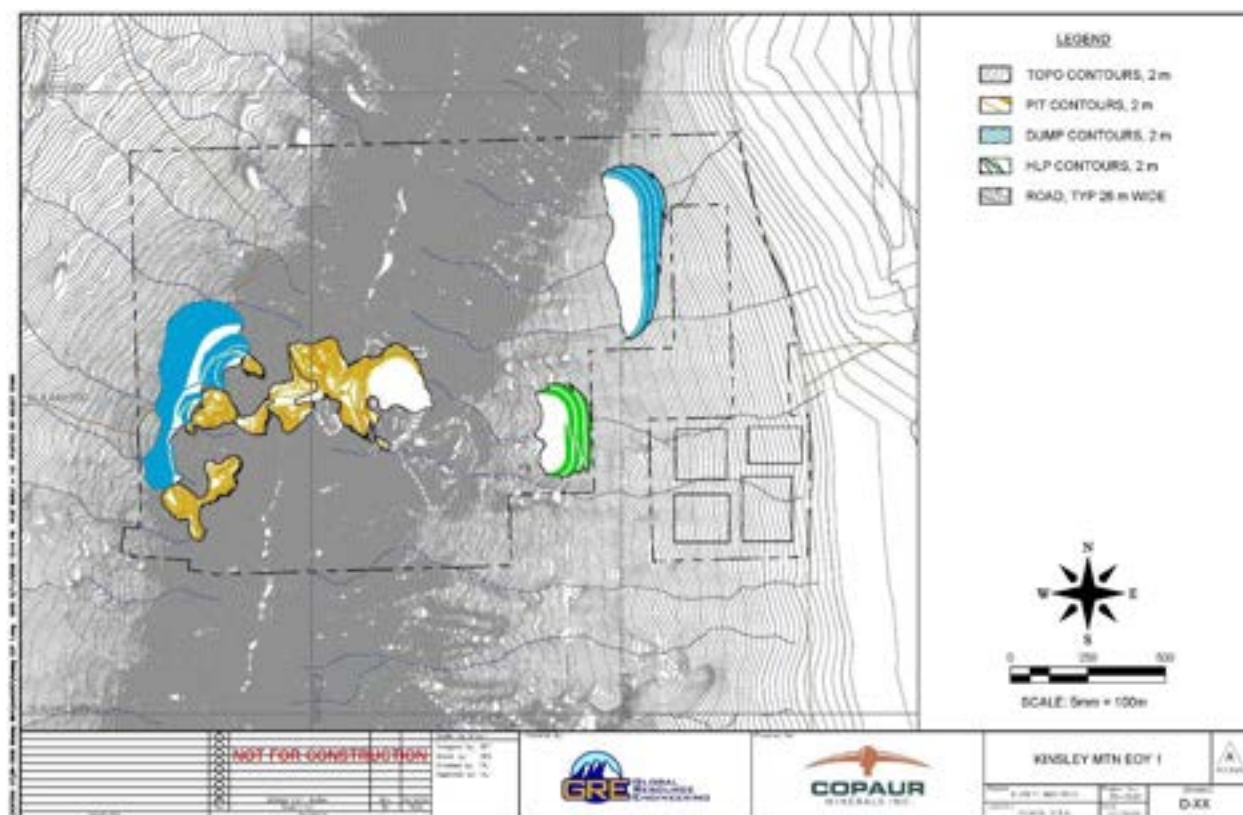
Phase Pit and Site Plan Layout Year 2
